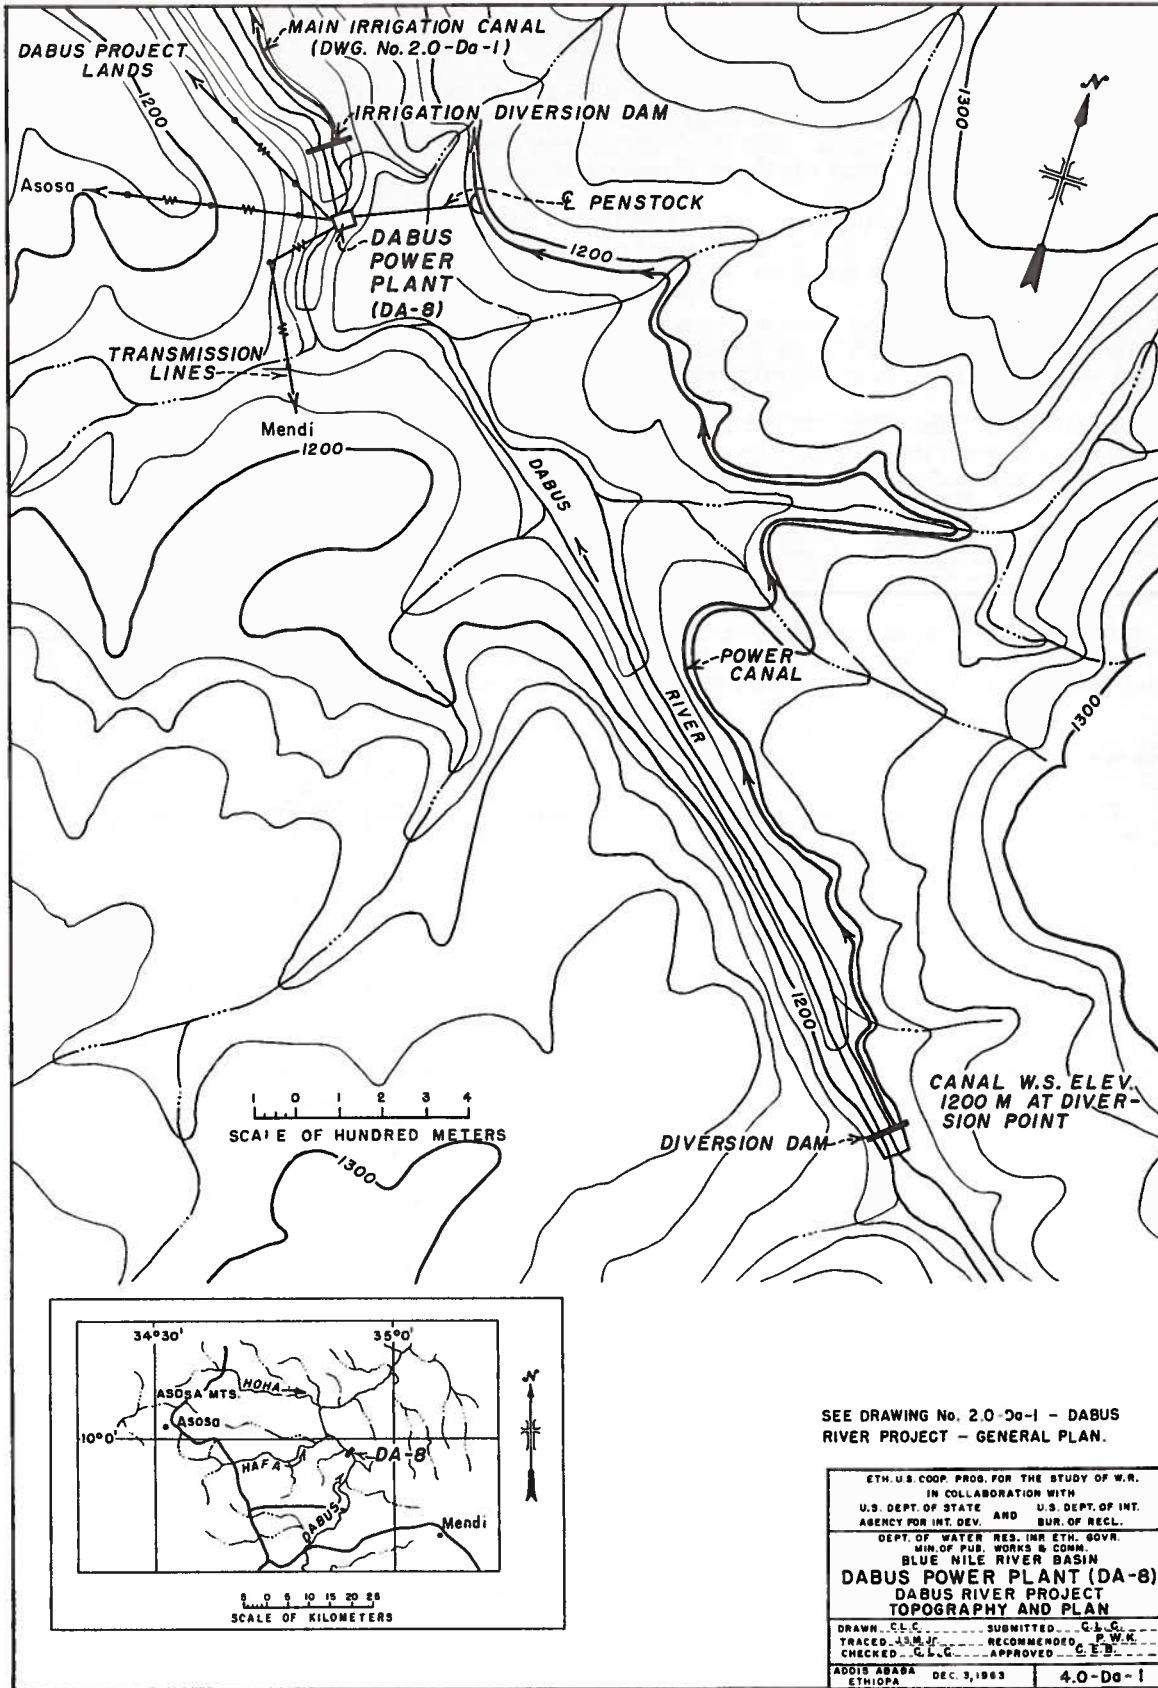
Dabus Power Plant (DA-8)--Topography and Plan
